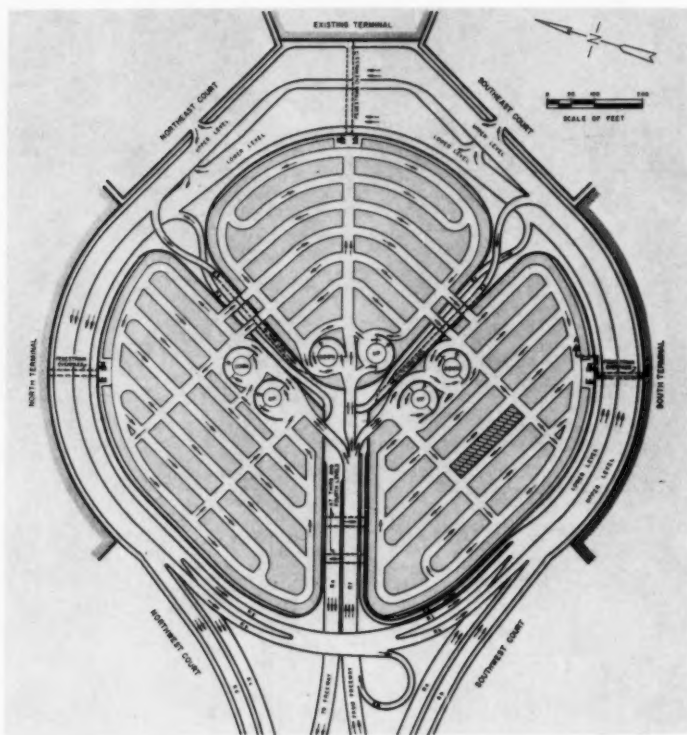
PROPOSED SECOND LEVEL OF PARKING GARAGE
